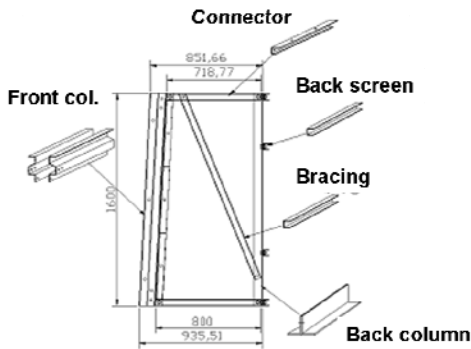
Steel-framed facing wall components (dimensions in mm)
